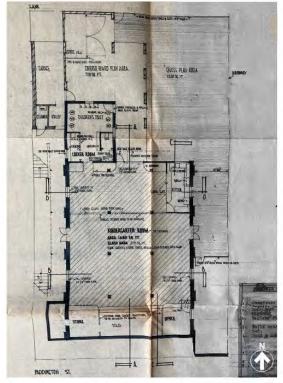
Proposed Lower Ground Floor Plan, dated July 1972, by Stafford, Moor & Farrington. Note the elevated walkway, connecting the main Church building to the rear building. Source: Church of Christ Archives.
